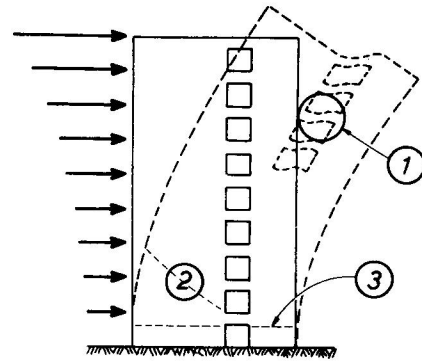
THE DISTORTIONS IN A LATERALLY LOADED COUPLED SHEAR WALL
